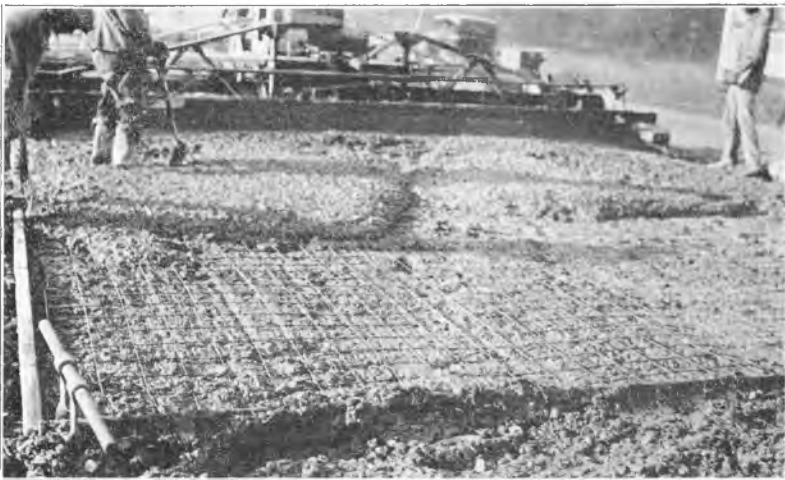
Covering with concrete. Cover batches of concrete have been deposited on top of the reinforcing sheets and the finishing machine is screening the final surface of the pavement.
